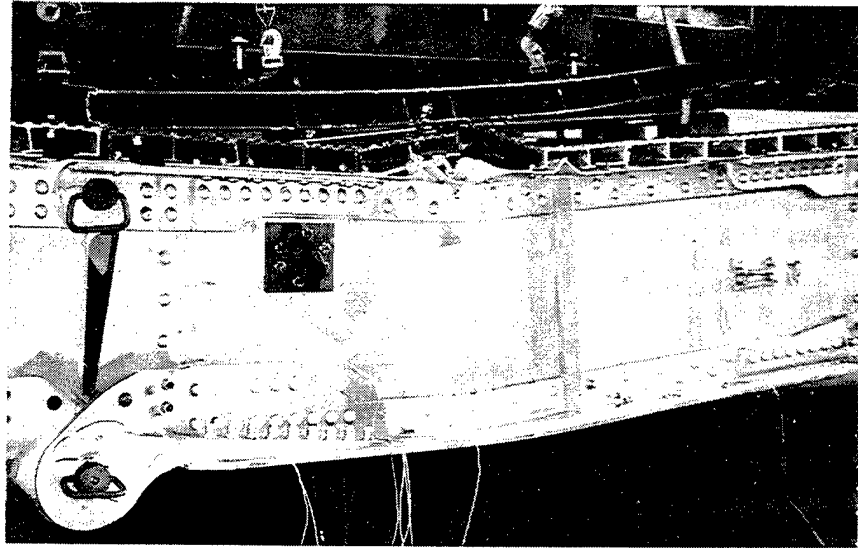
Close-up view of the buckled area in the No. 2 bridge in Figure 121. Note the extensive damages to the top chord, girder plate, extruded aluminum deck panels, and steel curb. The modified bottom chord angles did not crack, but bent at the buckled area. The buckling occurred closer to the center hinges of the female bridge section than in the other female section in Figure 124.
